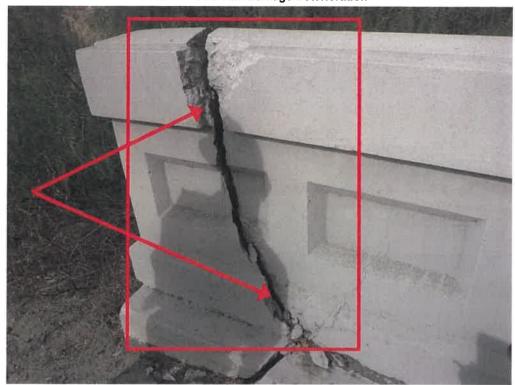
North rail wsterly end has a crack 1 inch wide.
